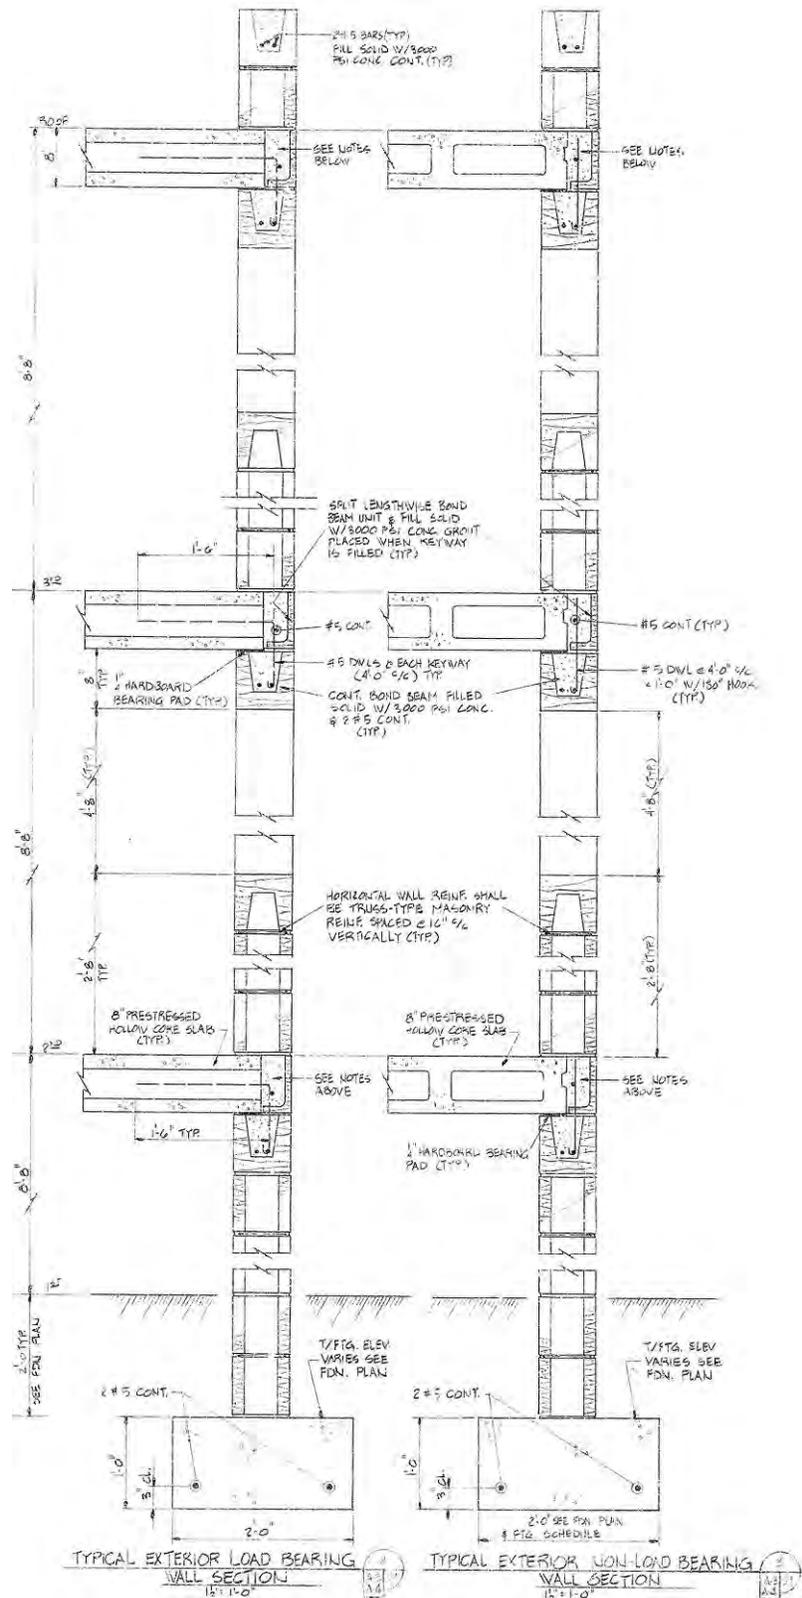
MOU masonry wall details, Fort Bragg, NC, 1982 (CON28-09-04 sheet 53 of 55; military operations in urban terrain, sections and details; 24 September 1982).
